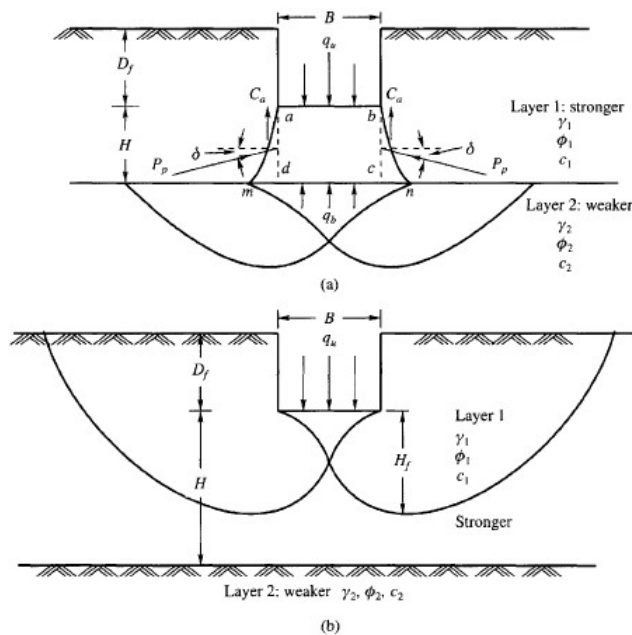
Failure of soil below strip footing under vertical load on strong layer overlying weak deposit (after Meyerhof and Hanna, 1978)
